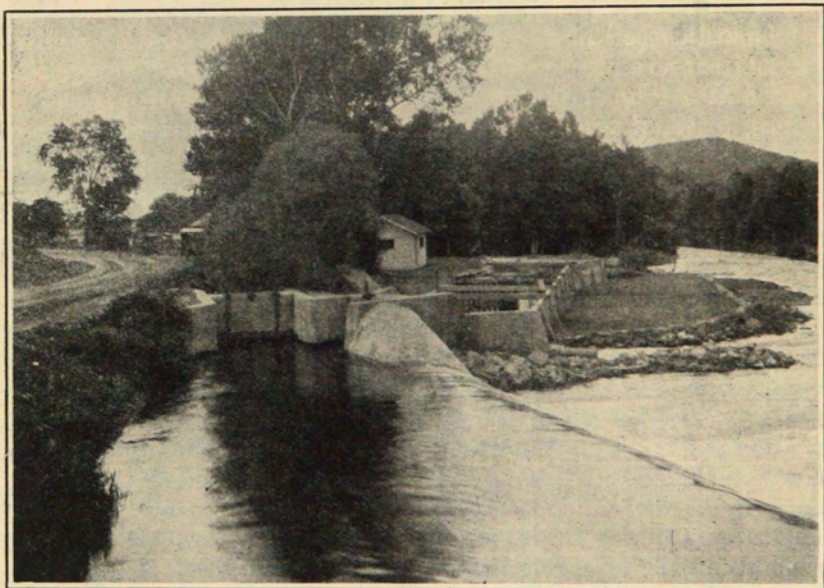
Irrigation Hydraulic Laboratory at Bellvue.
